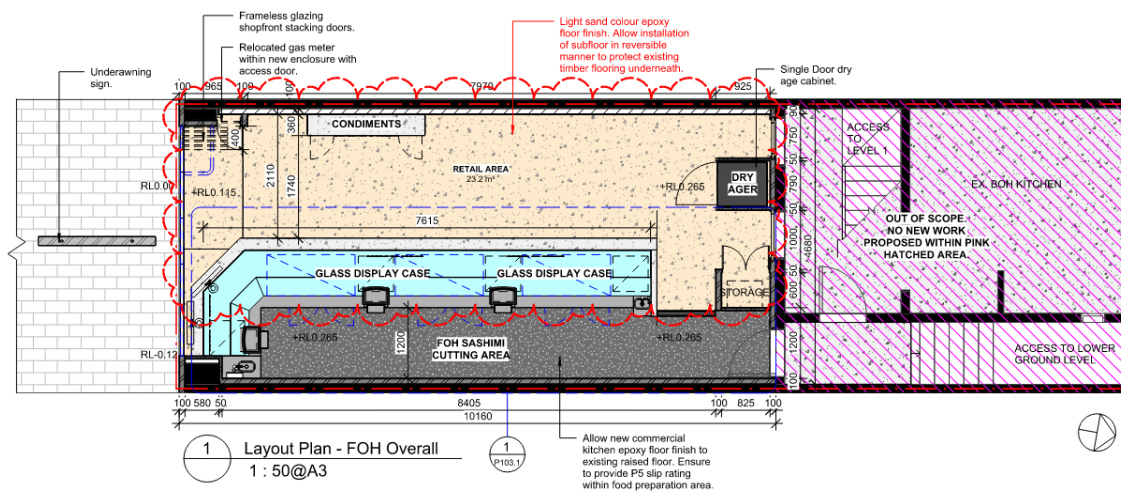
Proposed ground floor plan (Source: Liteco Studio)
